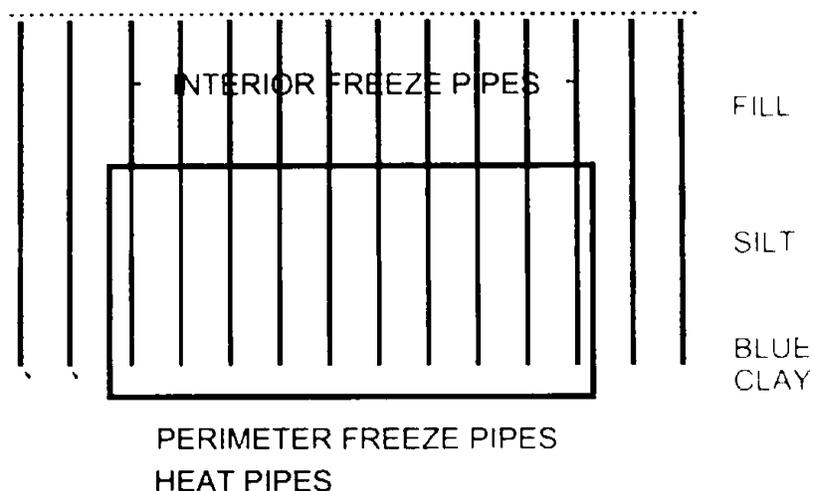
Schematic Arrangement of Freeze Pipes to Freeze Ground Mass Prior to Tunnel Jacking
